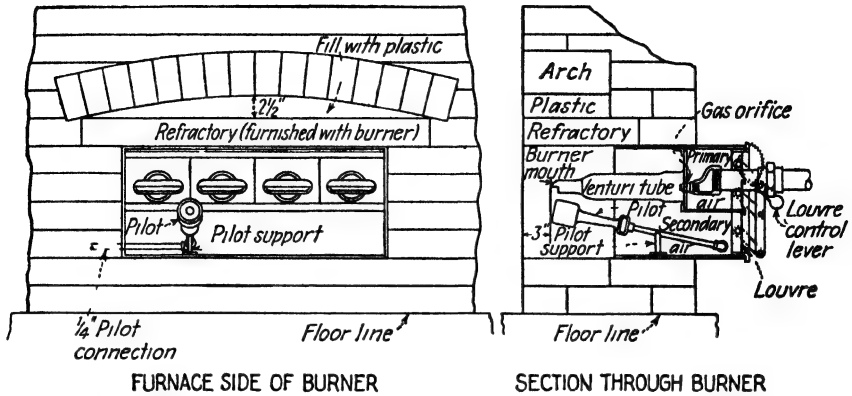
A large-port burner installation (Courtesy of Webster Engineering Company.)
